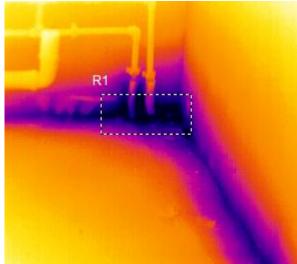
Thermal image of the basement floor at the utilities exit on the 1st floor of the building.
